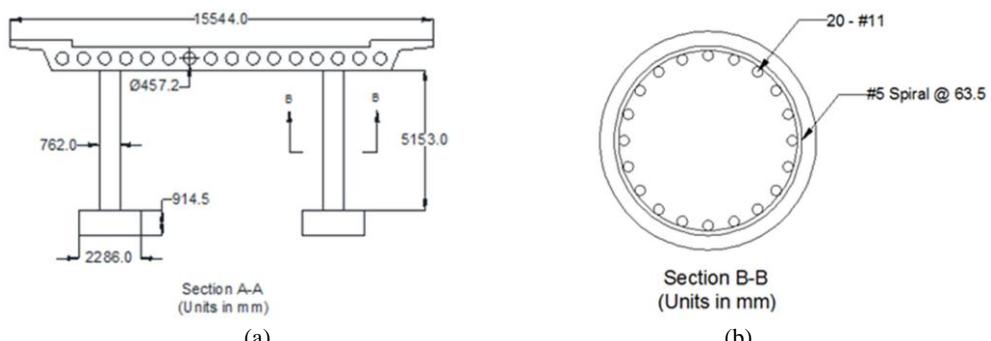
(a) Cross Section of Terminal Avenue Bridge Super Structure; (b) Cross Section of Terminal Avenue Bridge Column
